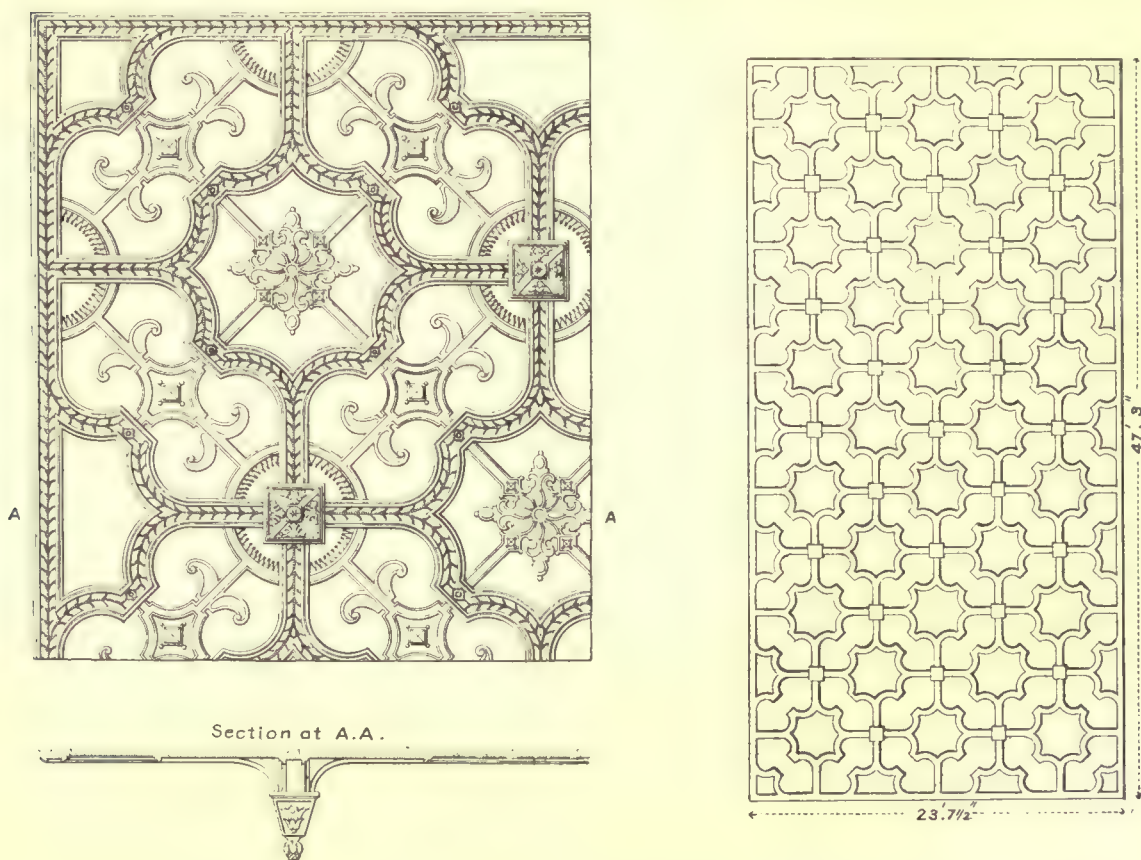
PLAN OF PORTION OF CEILING, GREAT ST HELENS, LONDON, E.C.
